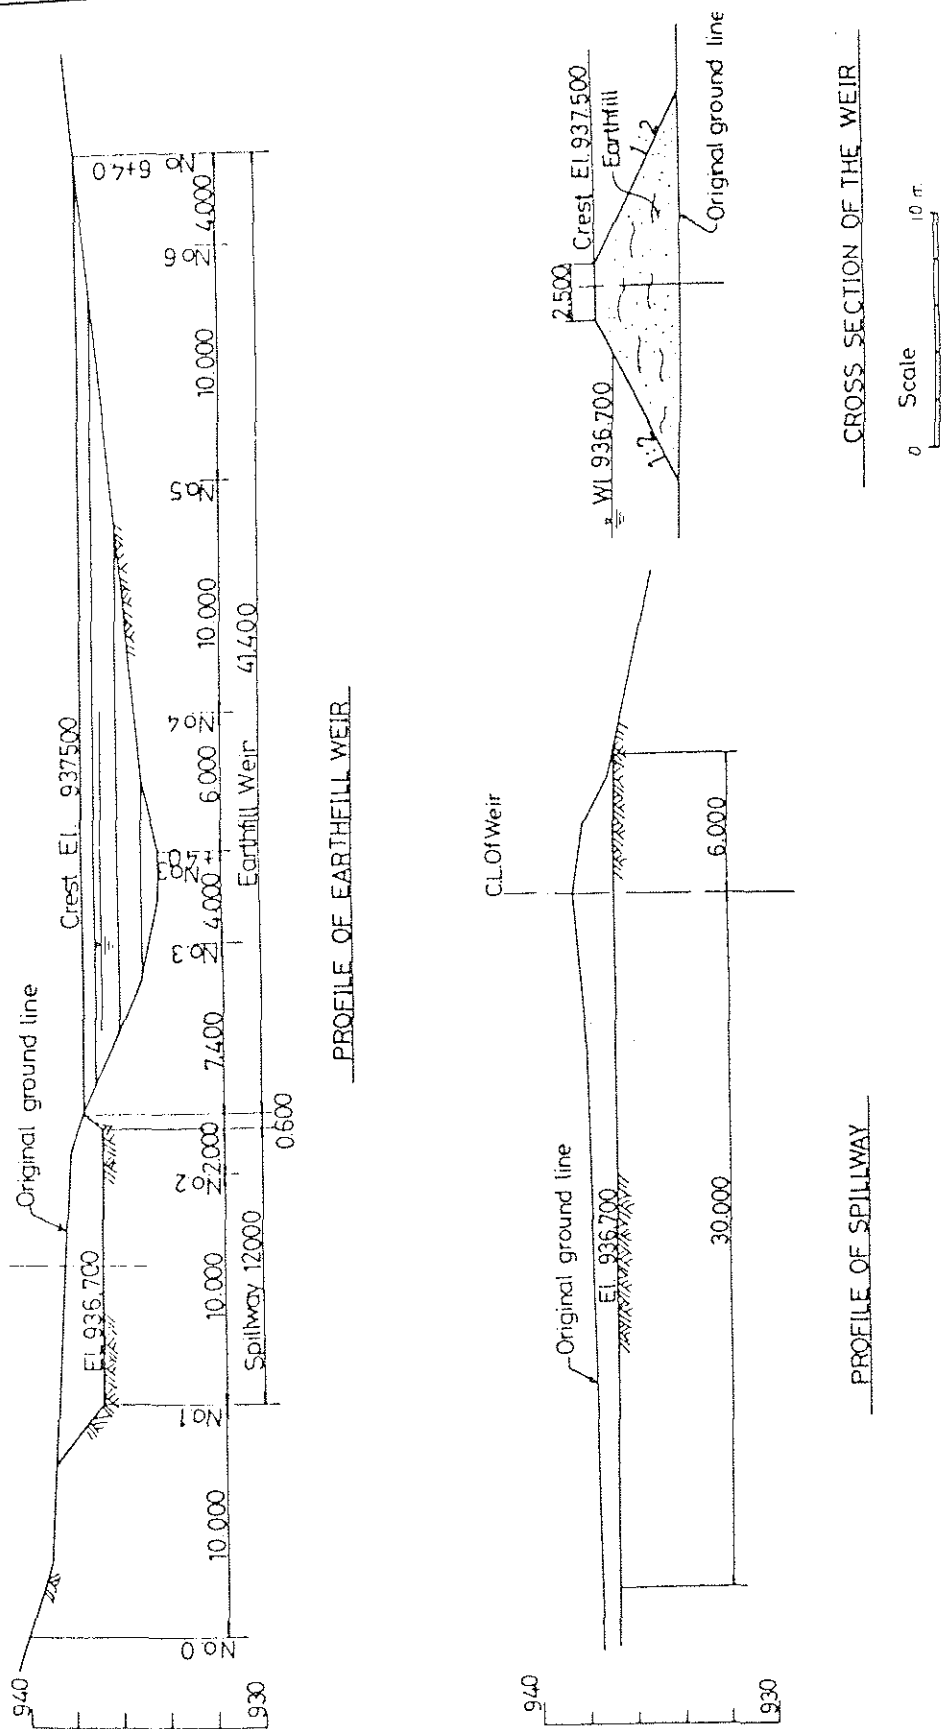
Cross Section of the Constructed Small Scale Weir
